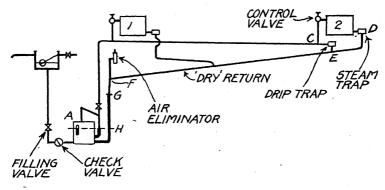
Simple arrangement of steam boiler, radiators and piping
